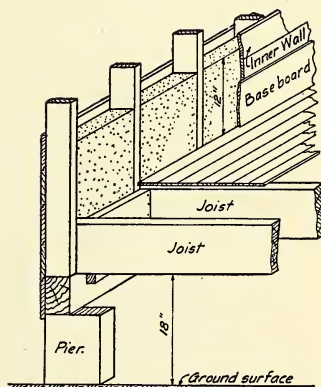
When buildings are supported on piers they are made ratproof by raising them eighteen inches or more above ground level and by placing concrete between inner and outer walls above the sill.
